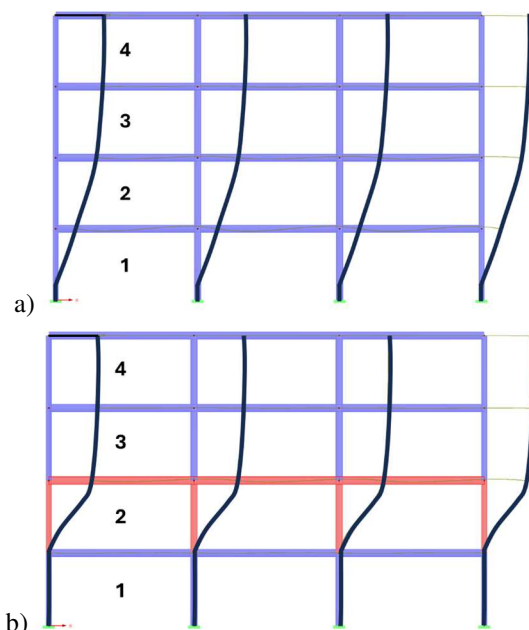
Buckling shapes of the outer column, a) buckling shape of column at a normal temperature of 20 °C, b) buckling shape of column no. 2 stressed by fire (the 2nd floor is a fire section).
